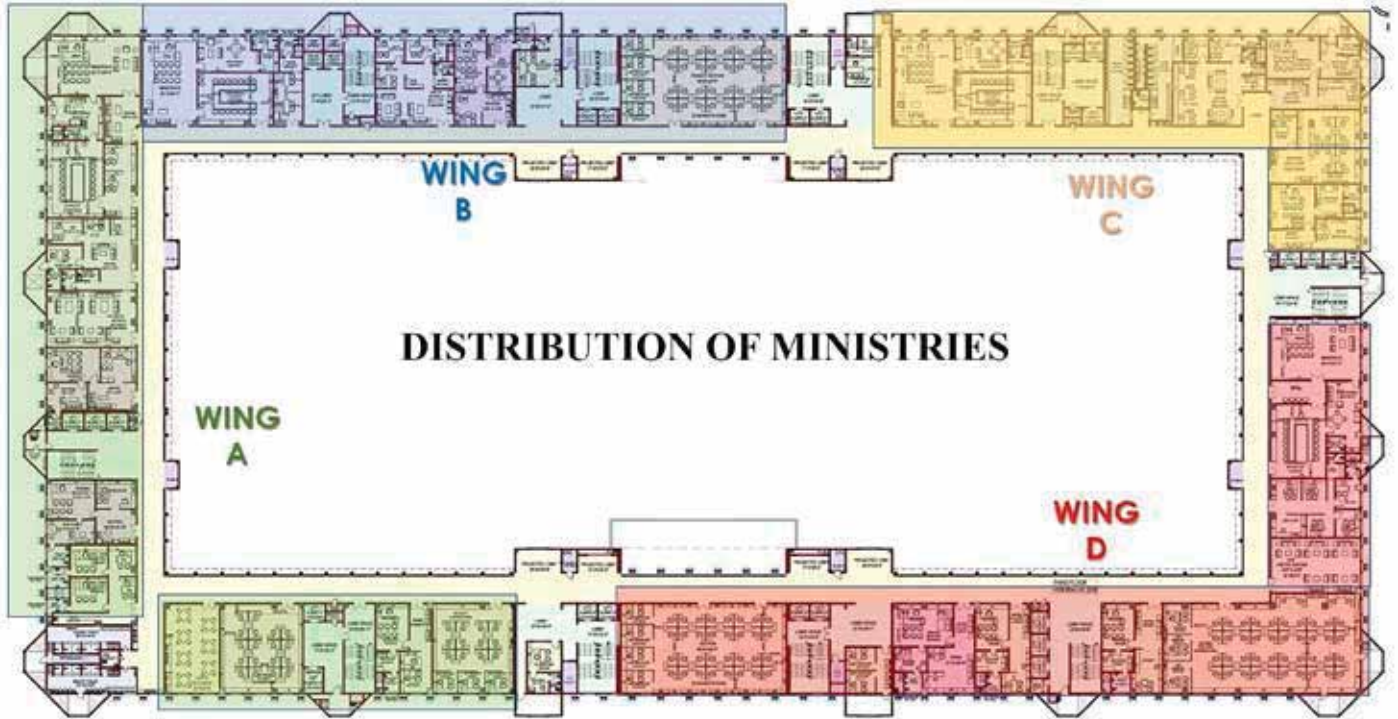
Floor Plan Zoning of the Telangana State Secretariat
